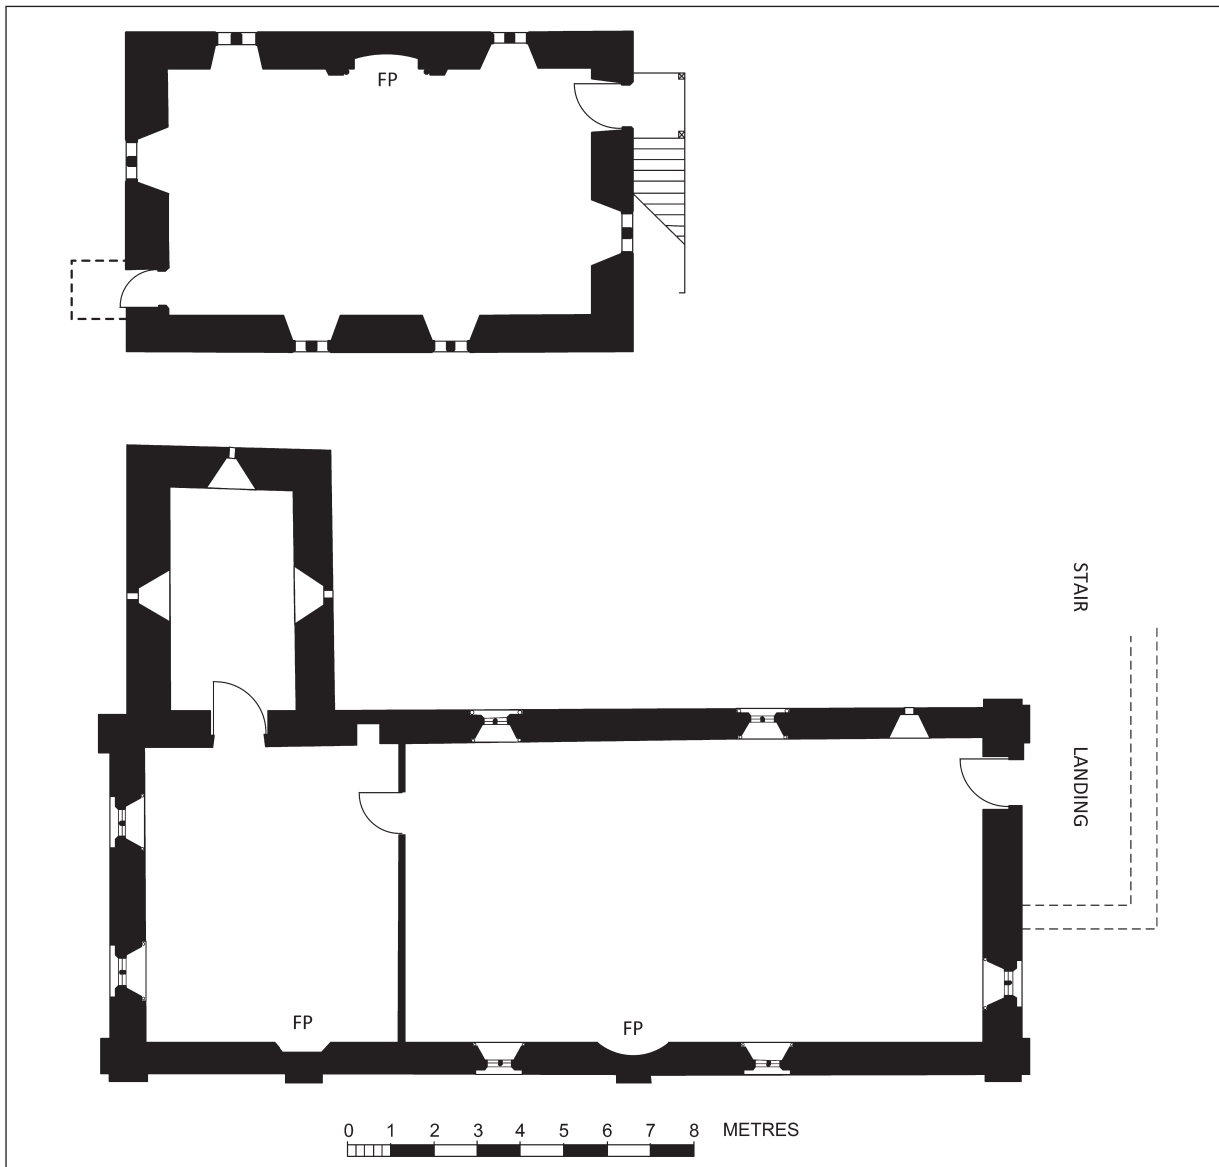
Reconstructed first-floor plans of Hemingford Grey Manor House and the School of Pythagoras, at the same scale
